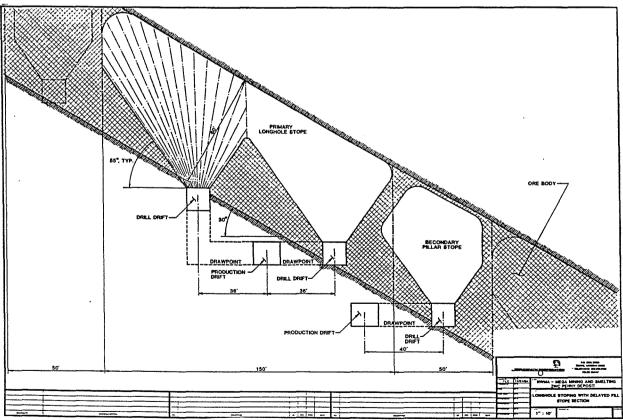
Longhole Blasting Plans (provided by Neil Pacey of J. S. Redpath).
